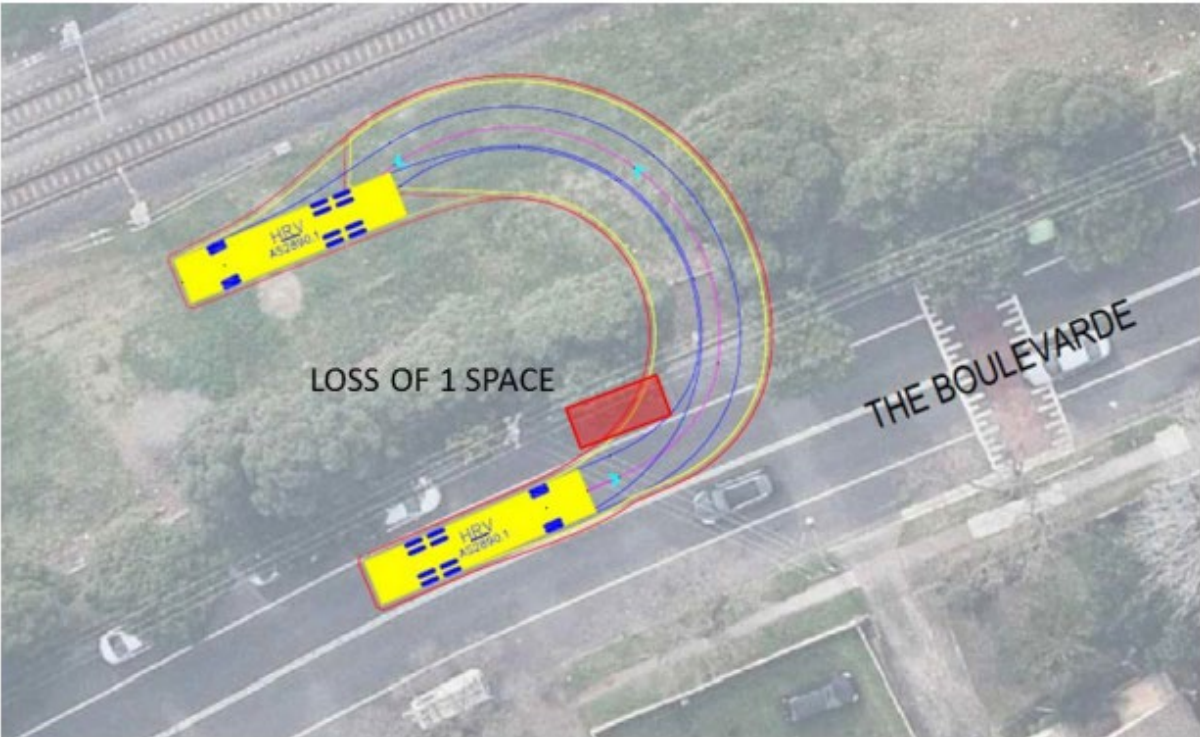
BE9 – M24 14.229U Parking Space Loss
